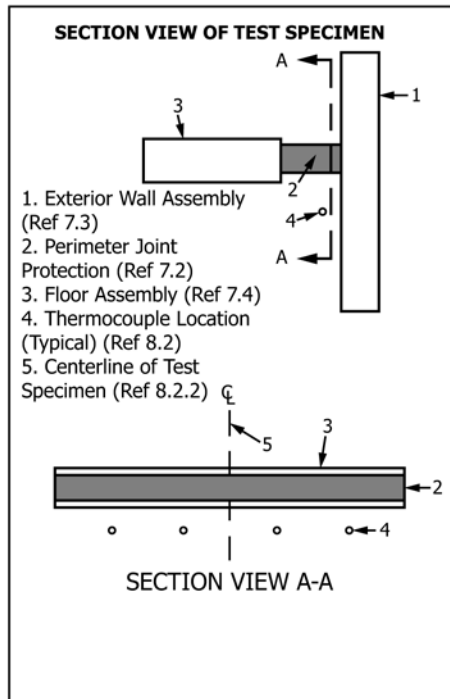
Exposed Thermocouple Layout in Test Room (See 8.2)
